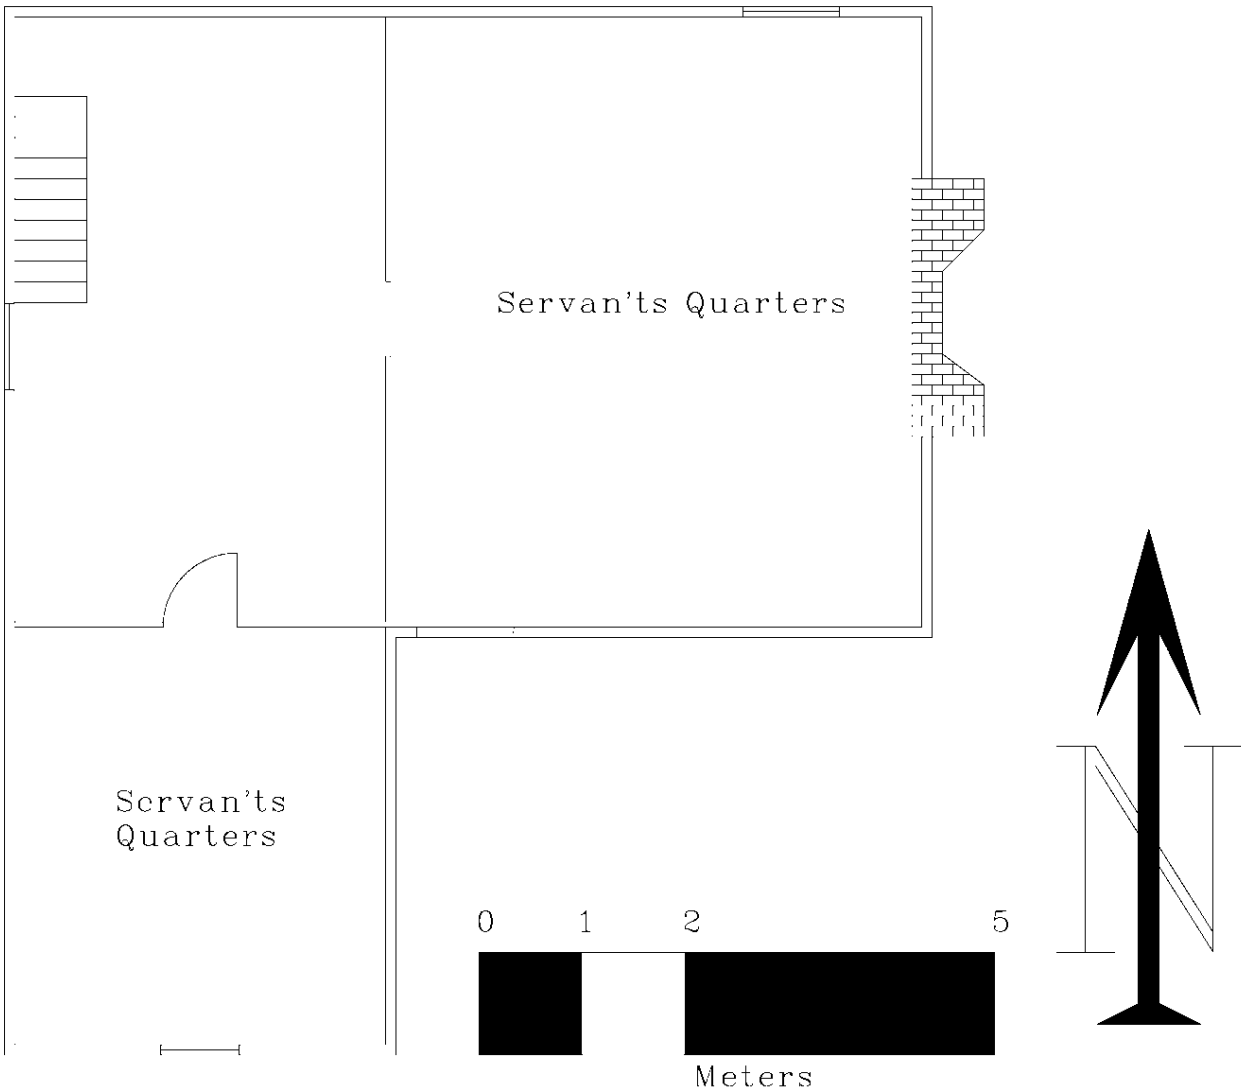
Proposed floorplan for the Hunt Club Lodge's second story added during the third construction phase. There appears to only have been servant's quarters added for the second floor.
